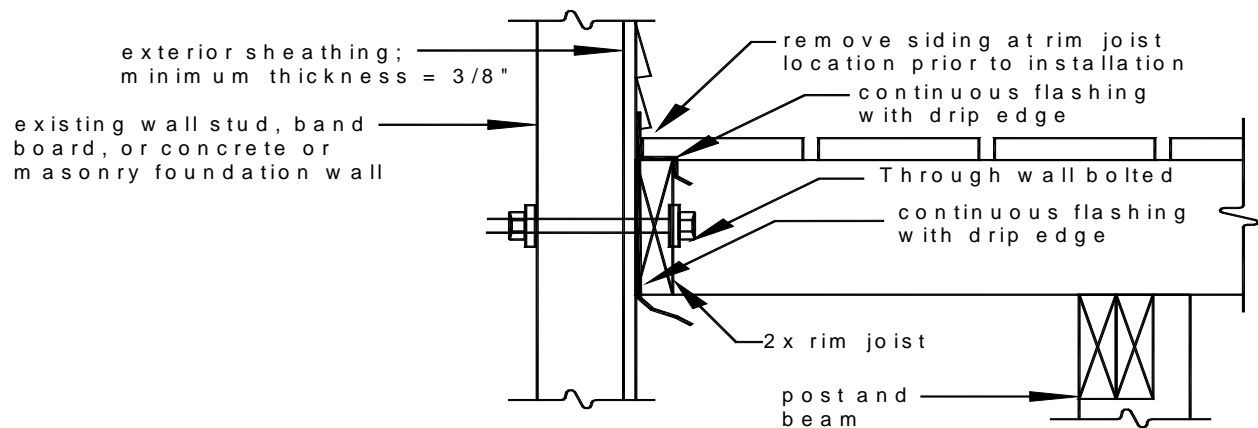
ATTACHMENT TO HOUSE LATERAL SUPPORT
